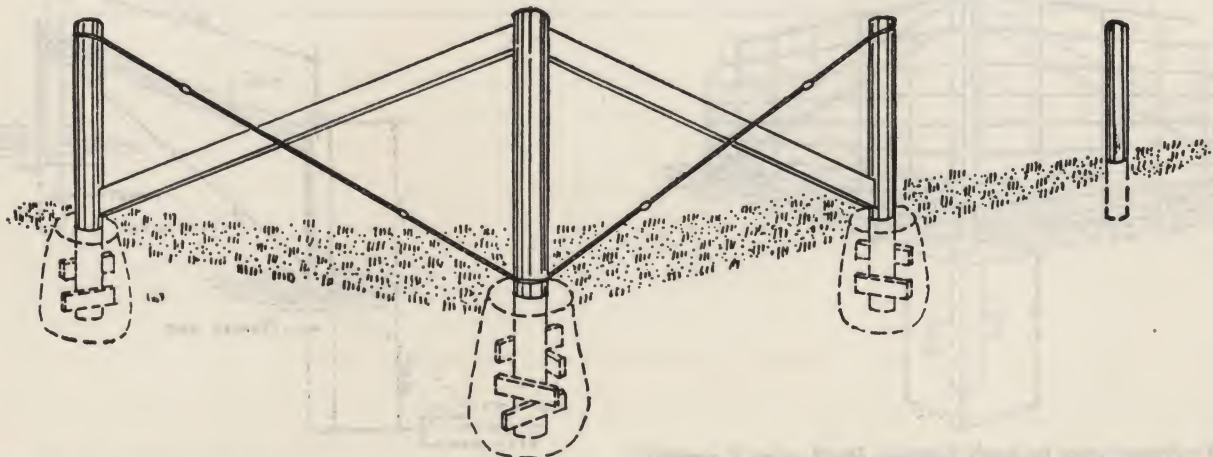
Proper method of bracing corner posts. Top of the concrete pier should be sloped away to allow drainage.
